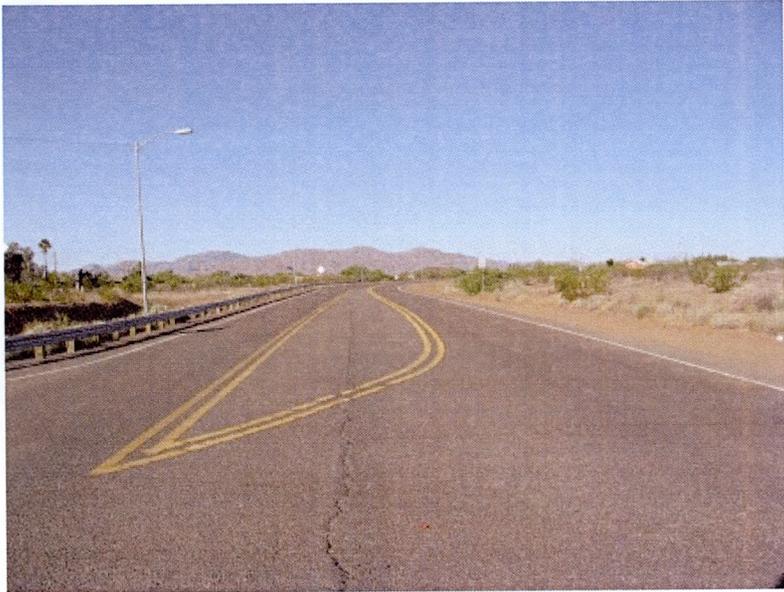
Same location as 239 looking SW down Happy Valley Road.
